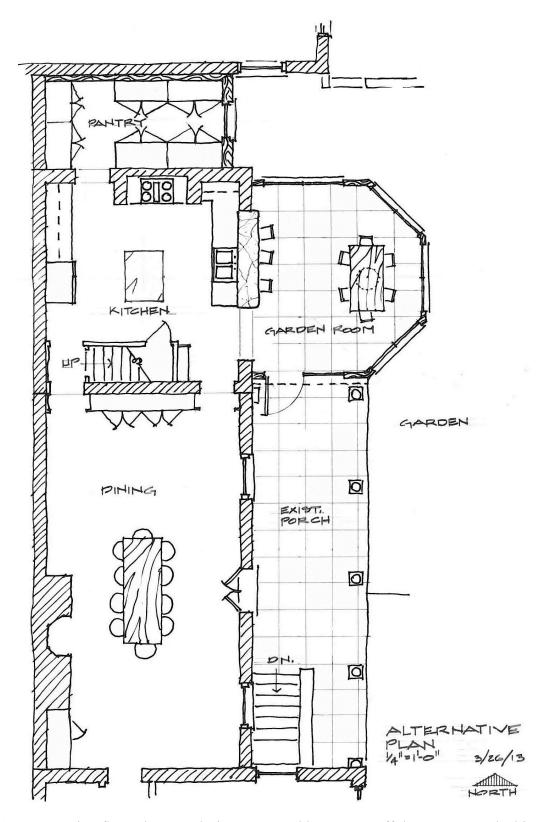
First floor alternate design presented by BAR Staff that preserves the historic masonry walls in what is, perhaps, the oldest part of the house
